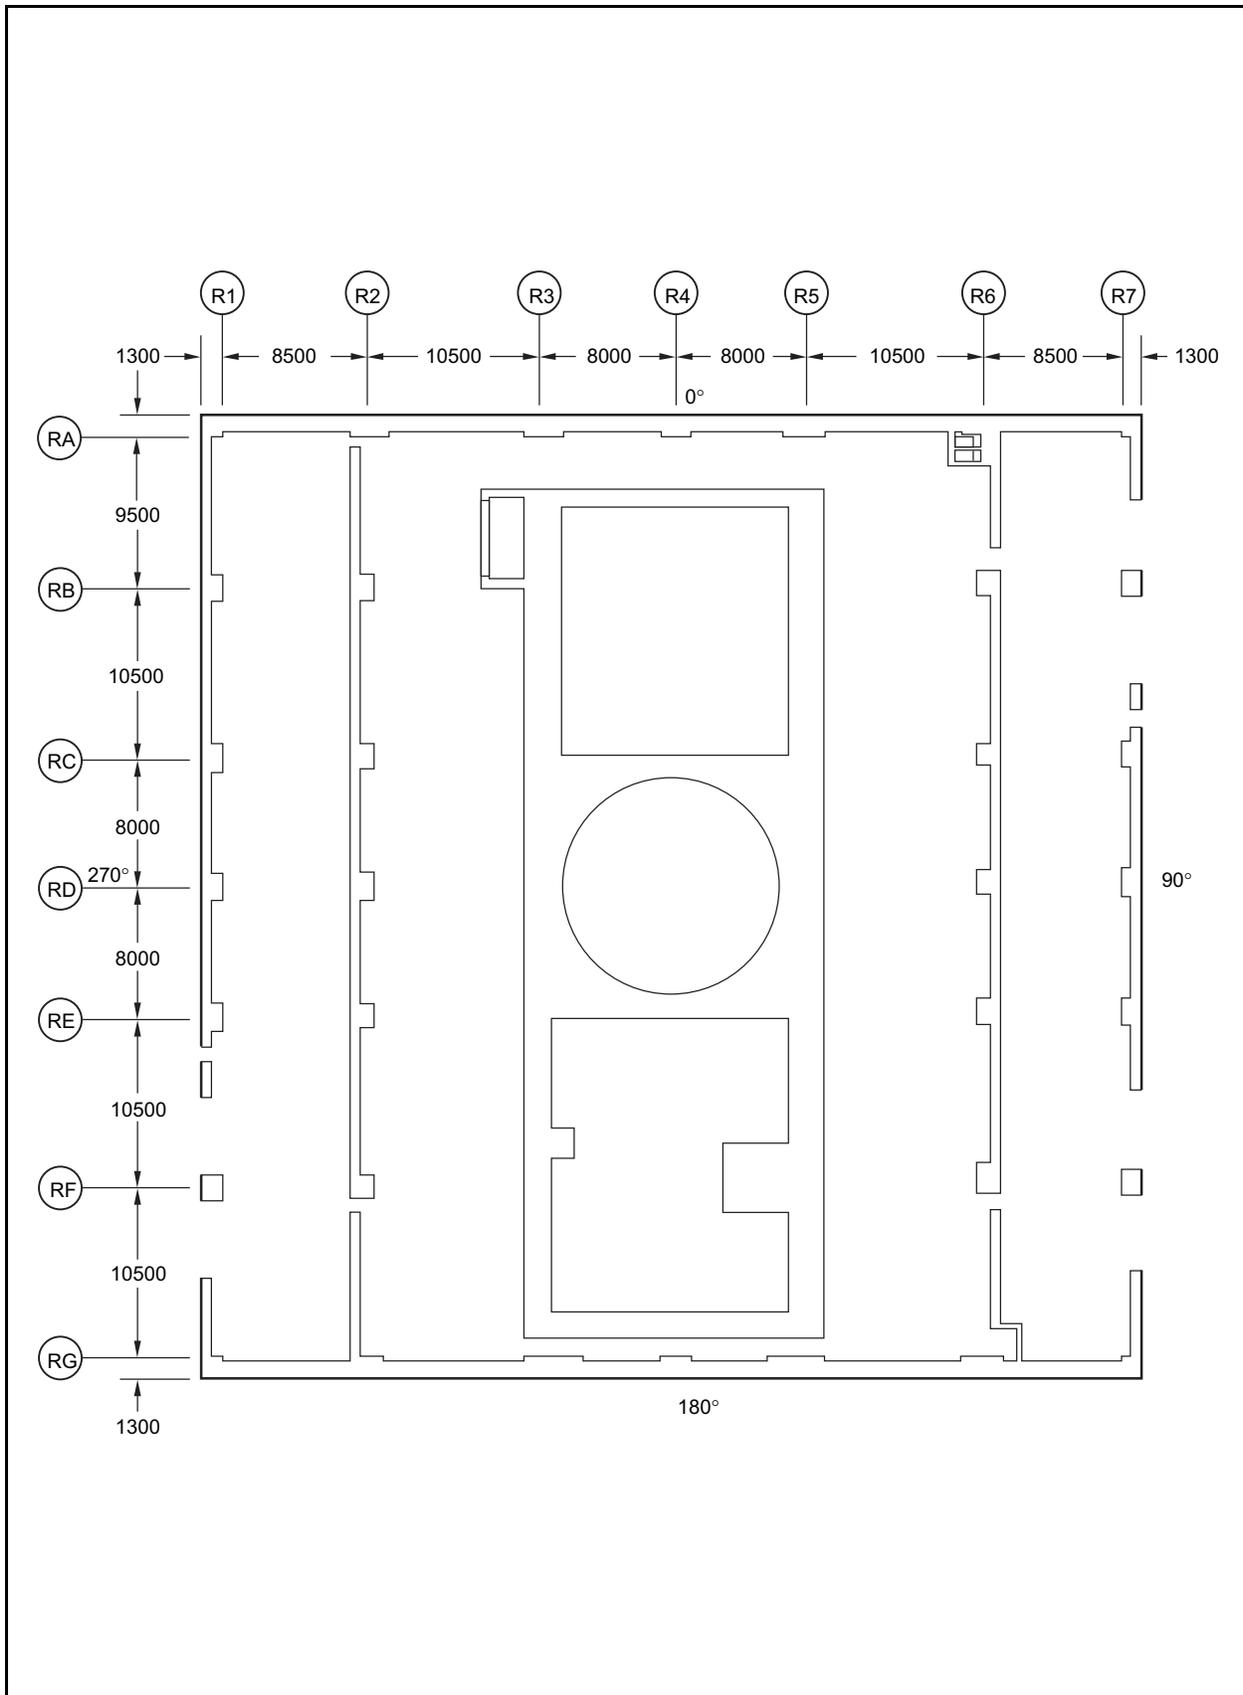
Reactor Building Arrangement Floor 3F Elevation 23500 mm
